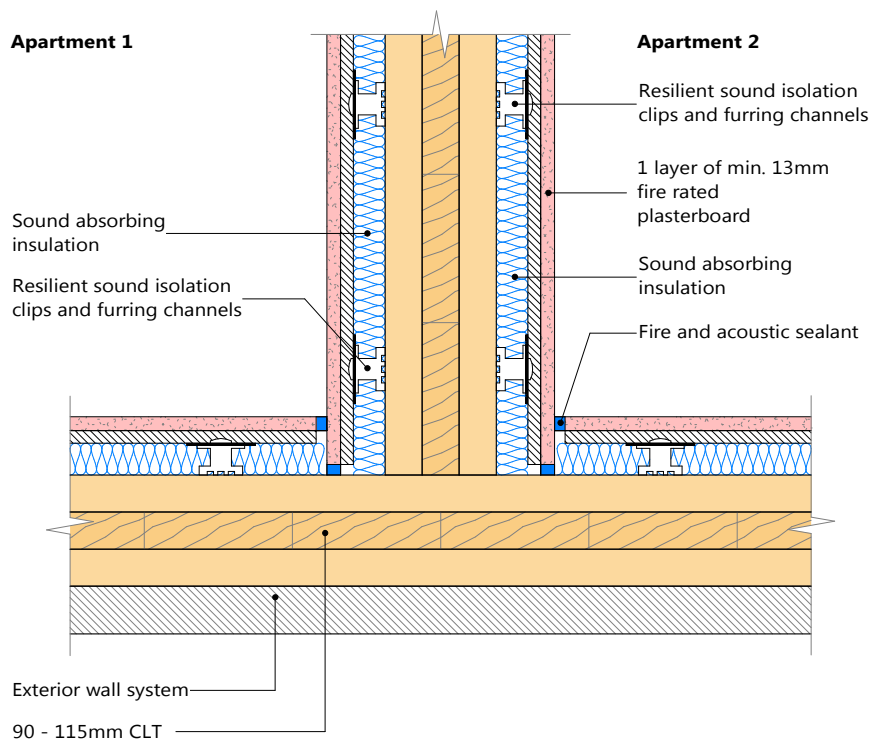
Plan view of intertenancy wall / exterior wall junction.
